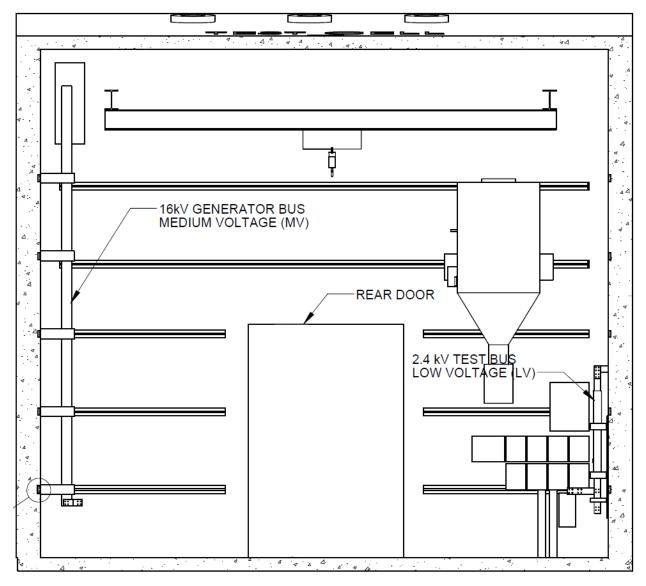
Elevation view of Test Cell #7. Low-voltage power connections located on right side of drawing.
